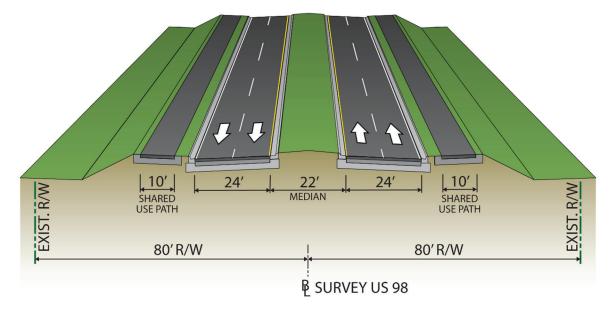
Proposed US 98 C3R (Suburban) Typical Section
